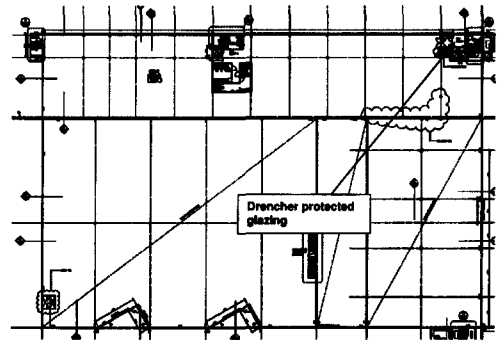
Proposed Drencher-protected glazing on Level 1
